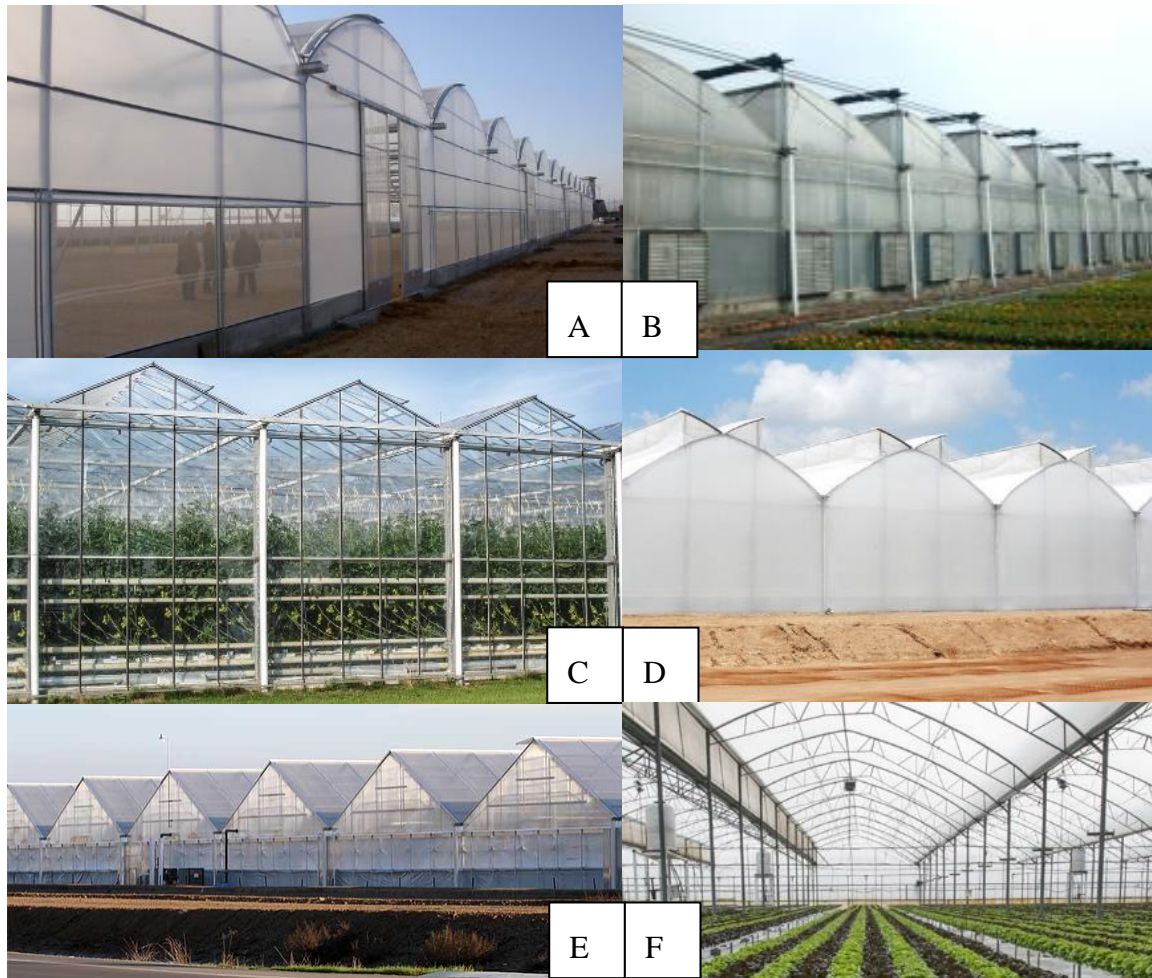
Multi-span greenhouses. A) Arch roof. B) Sawtooth. C) Venlo. D) Gothic. E) Gable roof F) High tunnel. [66-71].
